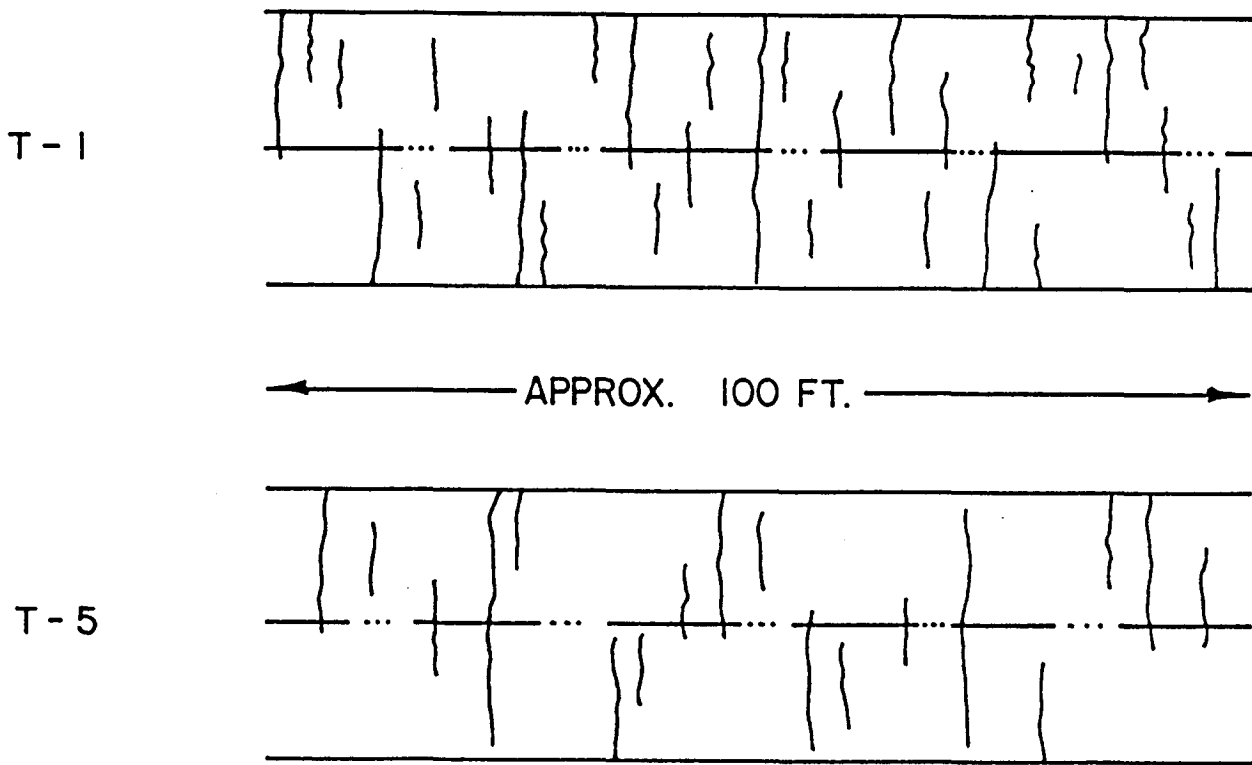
Typical cracking patterns in T-1 and T-5 sections for Pennsylvania (Kandhal et al. 1984)
